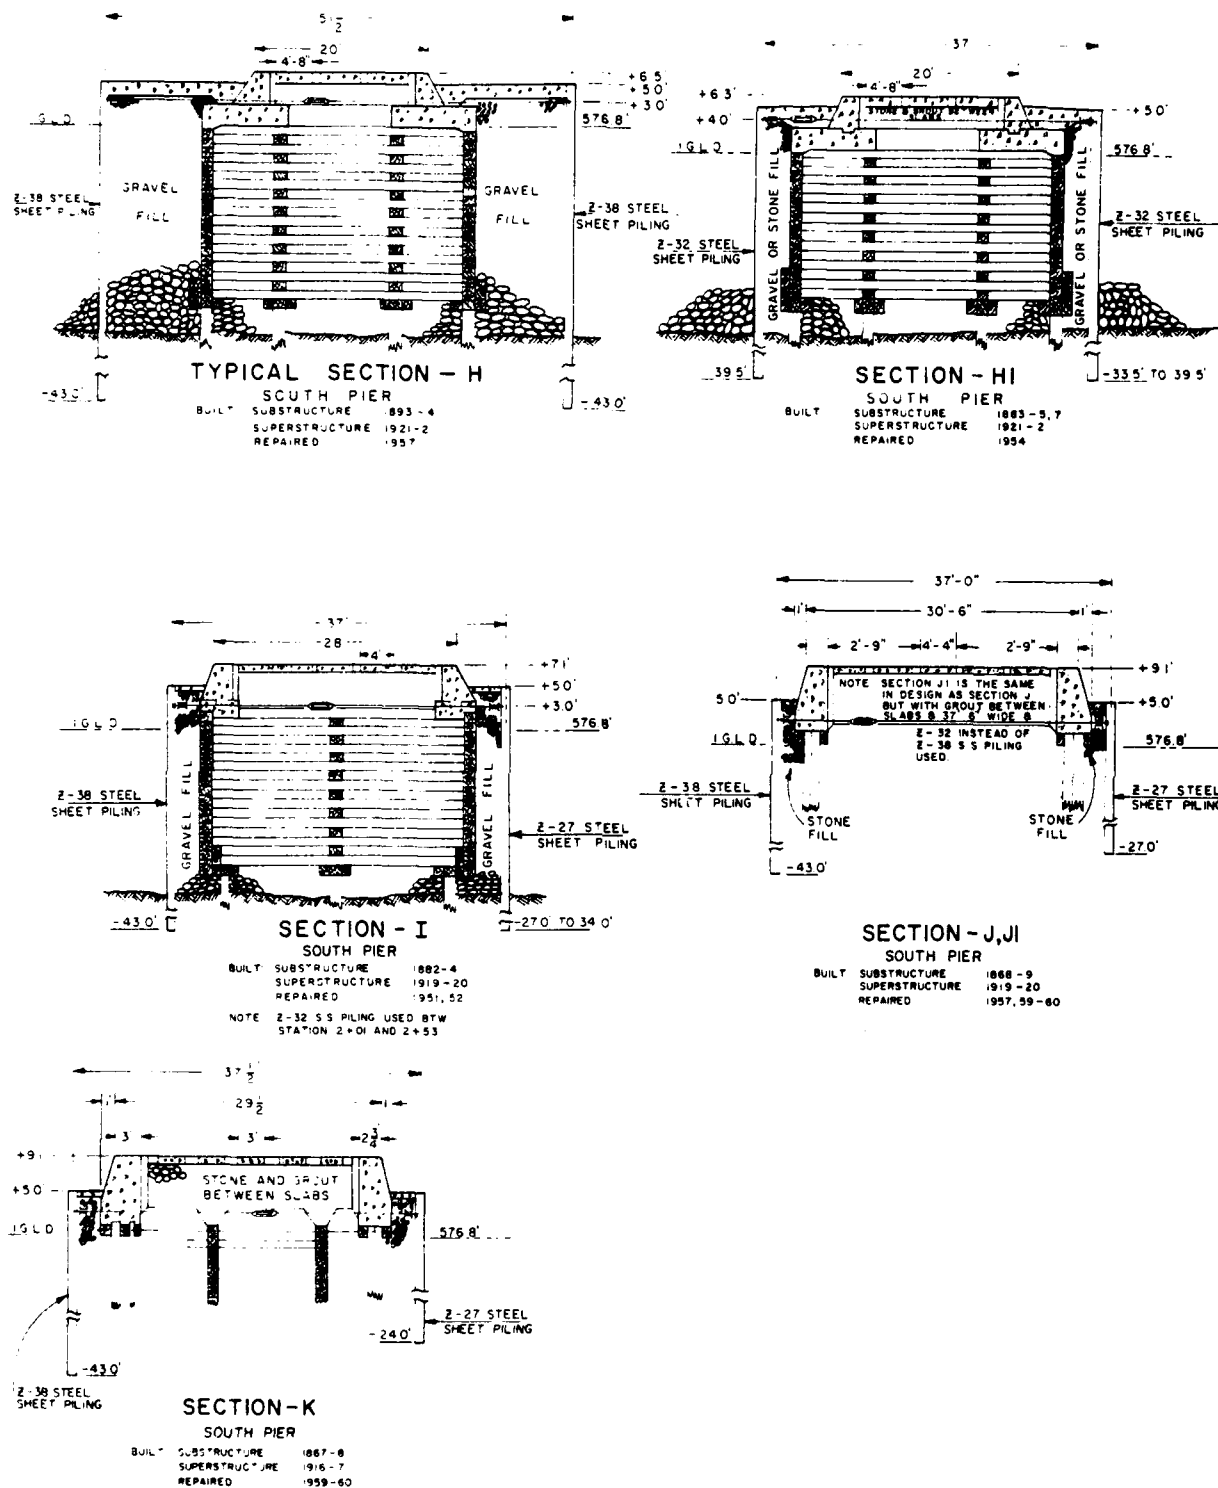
Typical south pier cross sections, Grand Haven Harbor, Michigan
